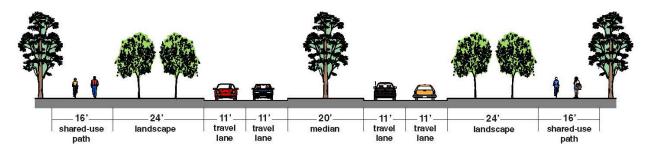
Two-Sided Trail Parkway Street Section with Separated Shared Use Path.
